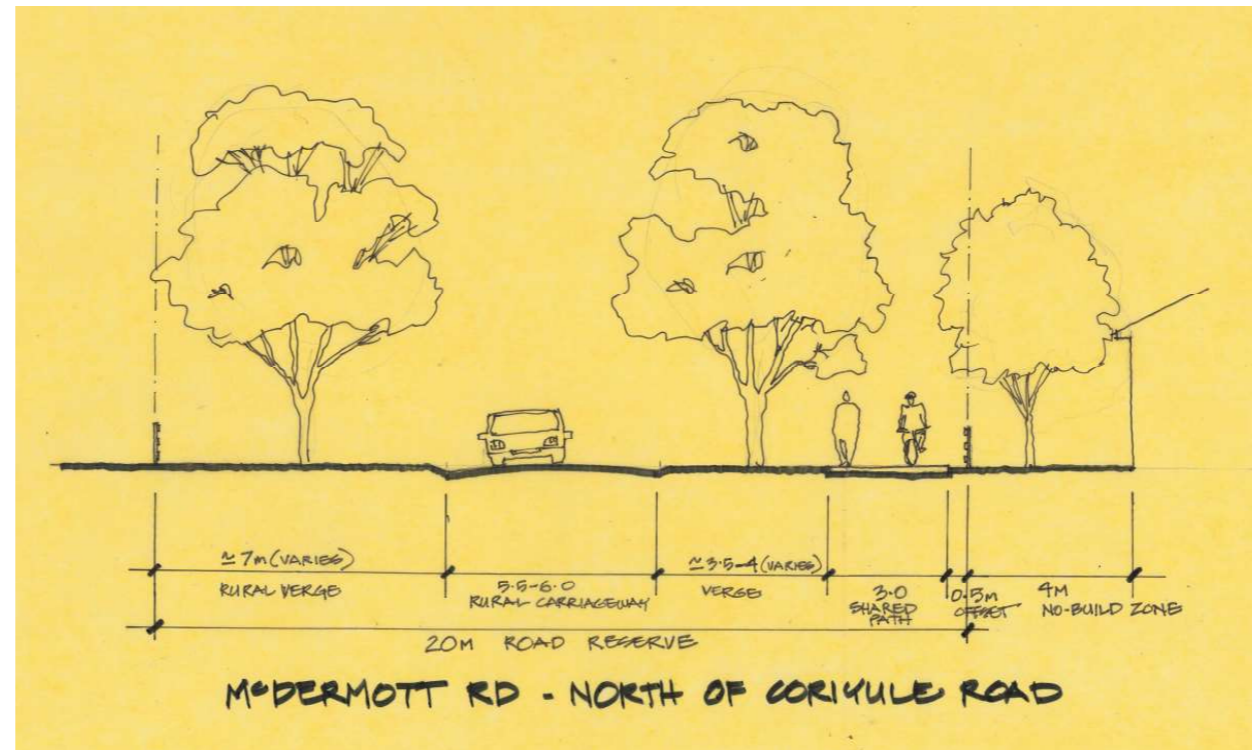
Proposed McDermott Road cross section adjacent to Properties 13 & 14
